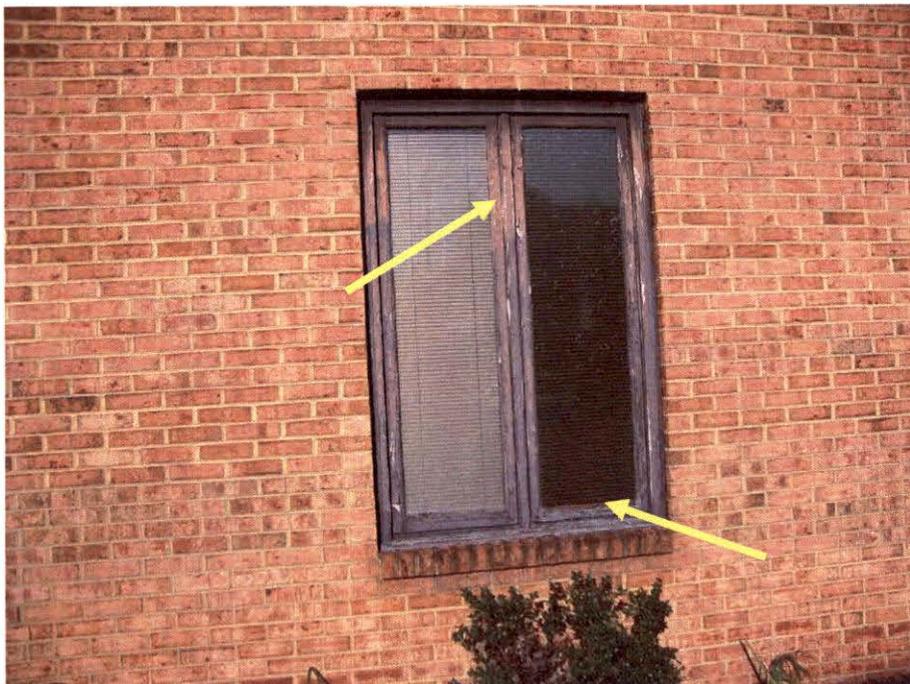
Typical view of window degradation at 1657 Merrimac Trail.
